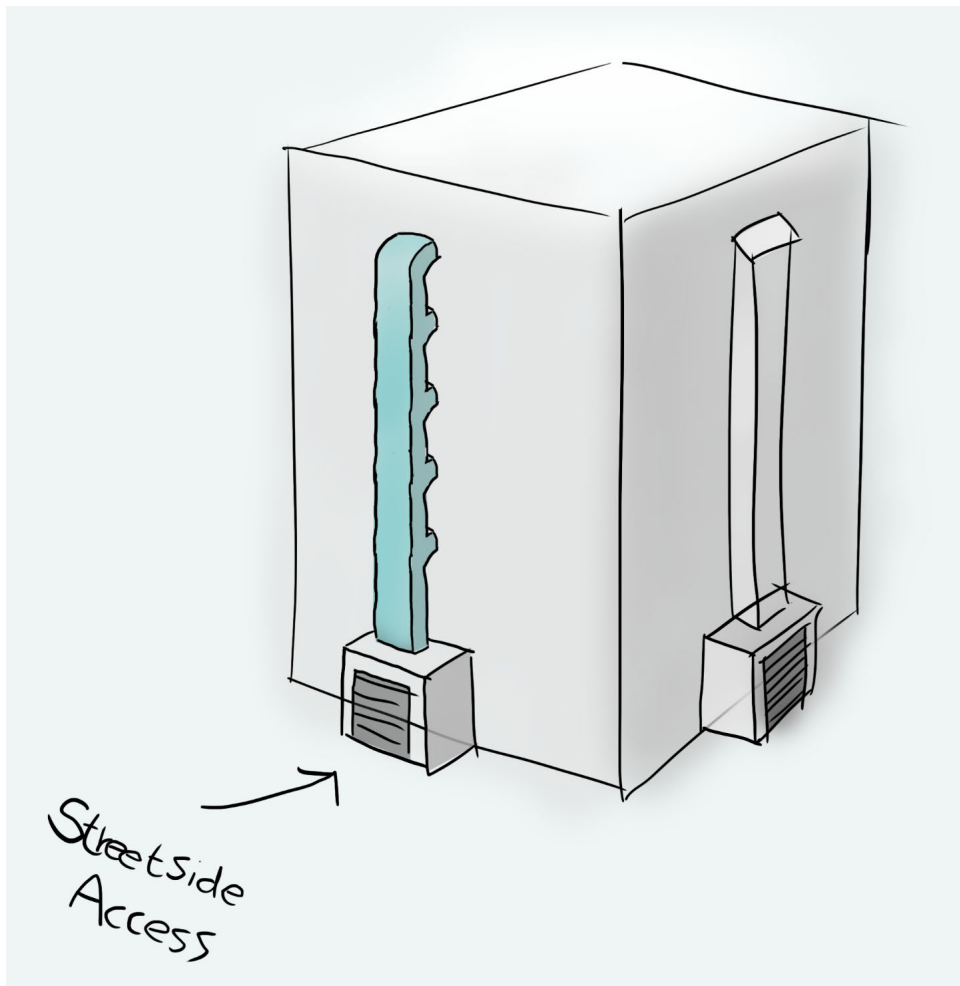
Alternatives for moving the waste down the building. Having outside chutes would make the waste more accessible for collections, but they would have a big impact on the appearance of the building.
